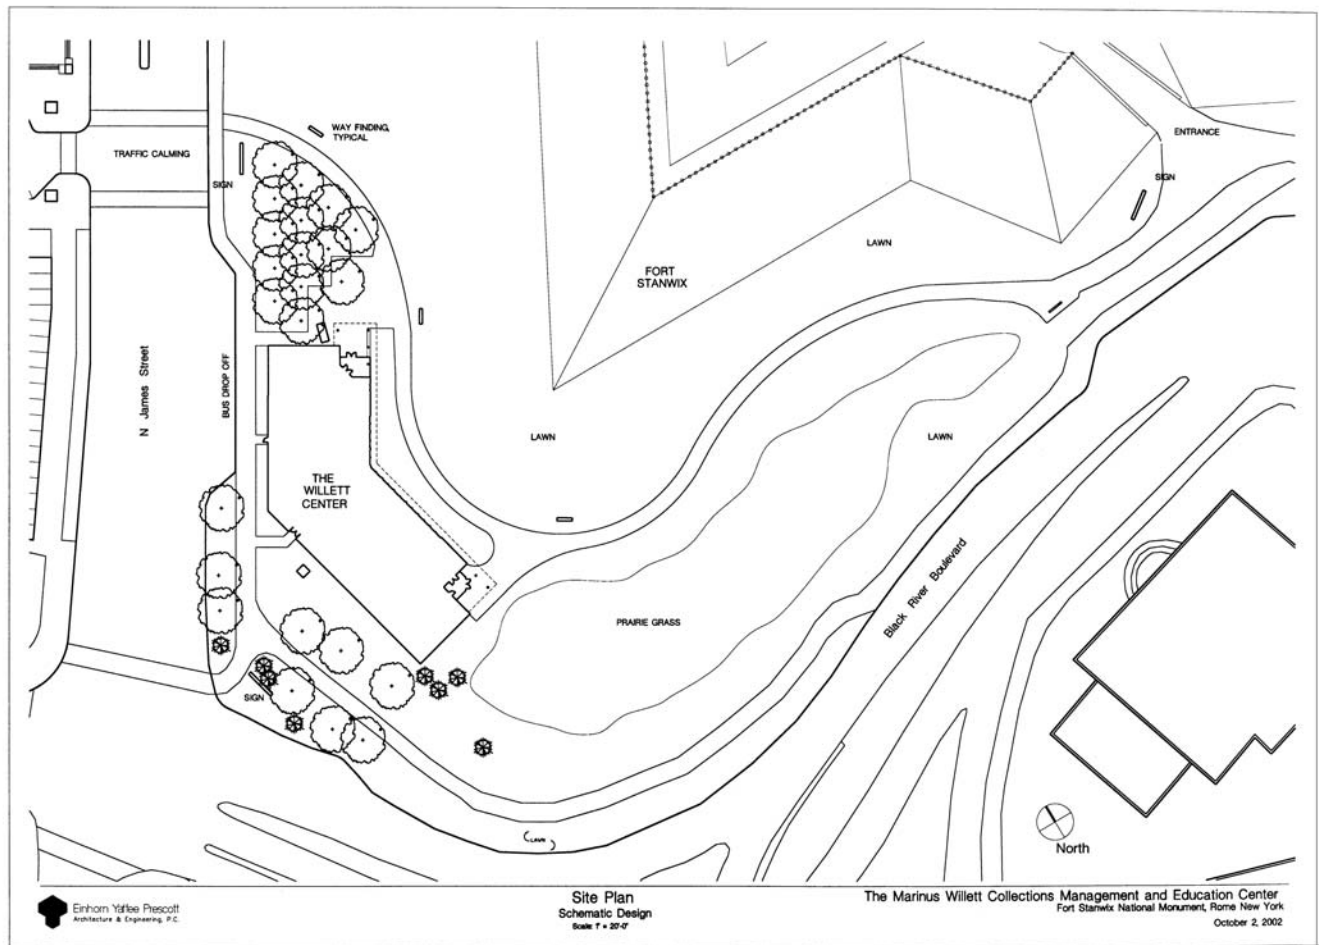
Proposed Fort Stanwix South Grounds Site – Existing Conditions.
